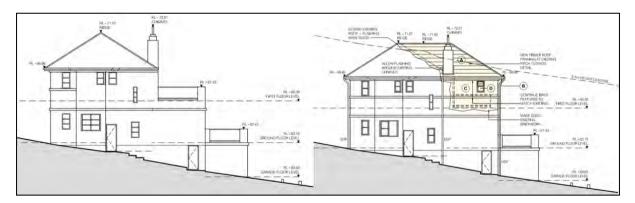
Existing East Elevation – EX201 A (left) and Proposed East Elevation – DA201 B (right)
